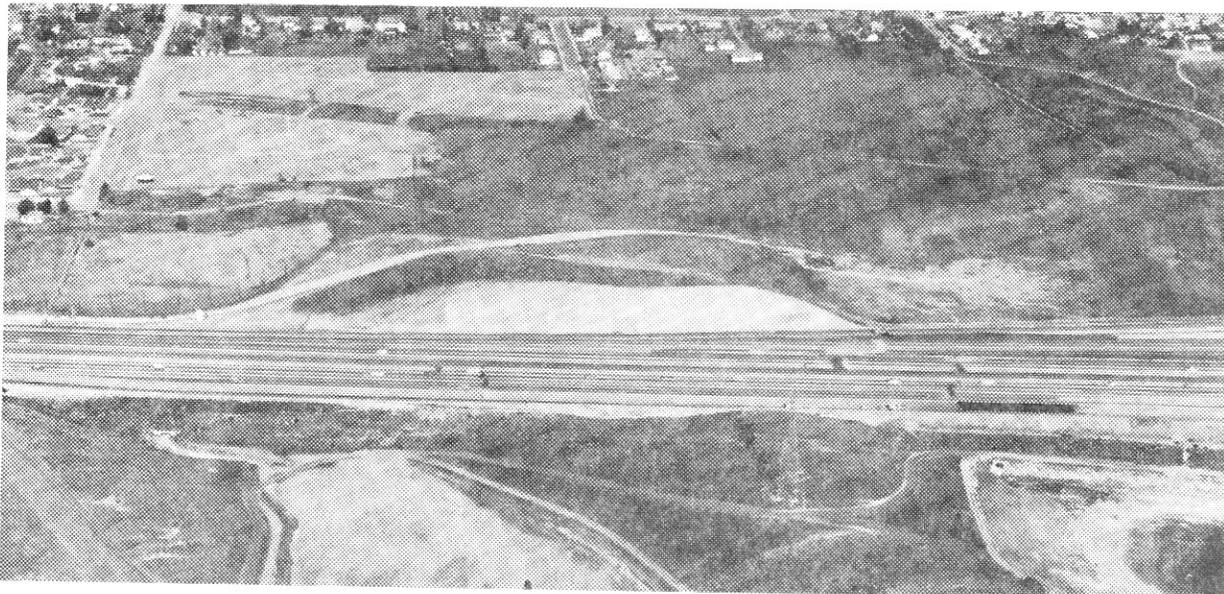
Looking northeasterly at Route 5. Cut slope in top center sustained cracking. Note patches in pavement.
